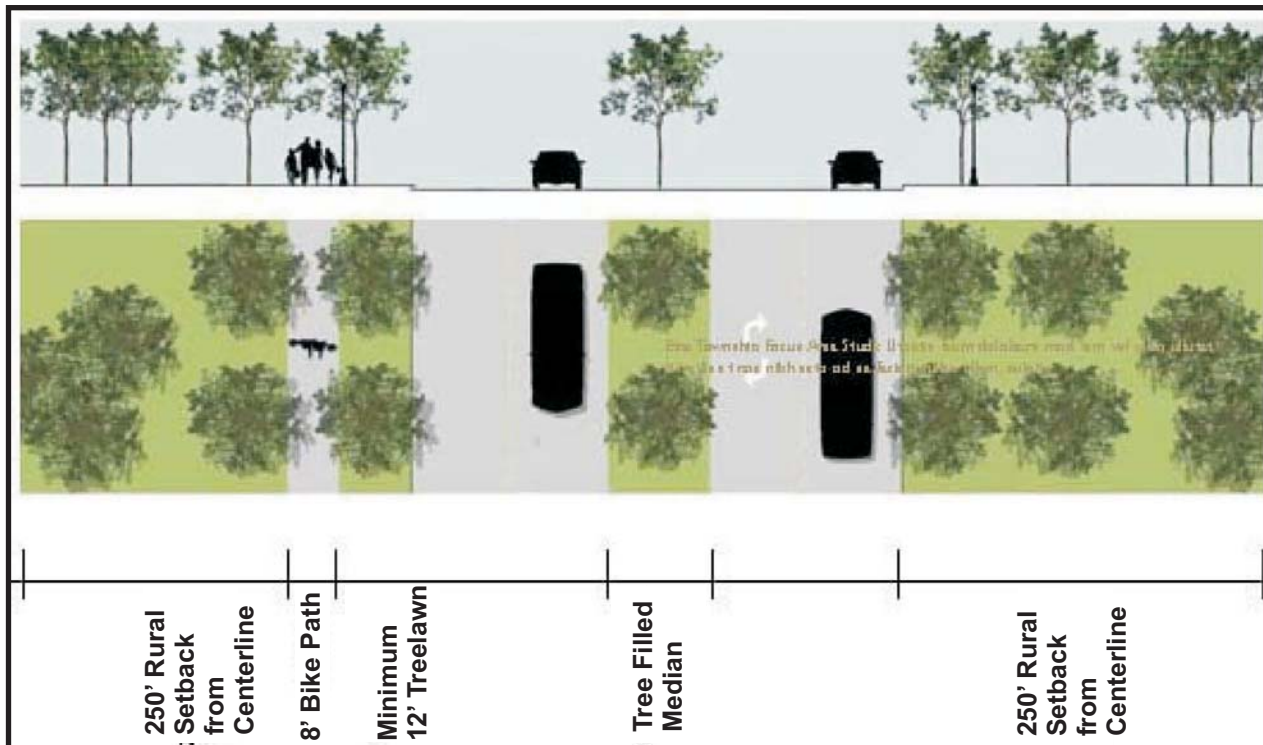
Naturalized Boulevard Street Typology (Source: Etna Township 310 Corridor Plan: Draft, MSI Planning and Design).
